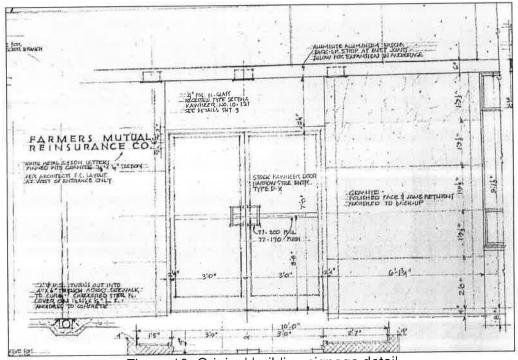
Original building signage detail (Haynes and Griffith, architects, January 1950, in the possession of the building owner)
